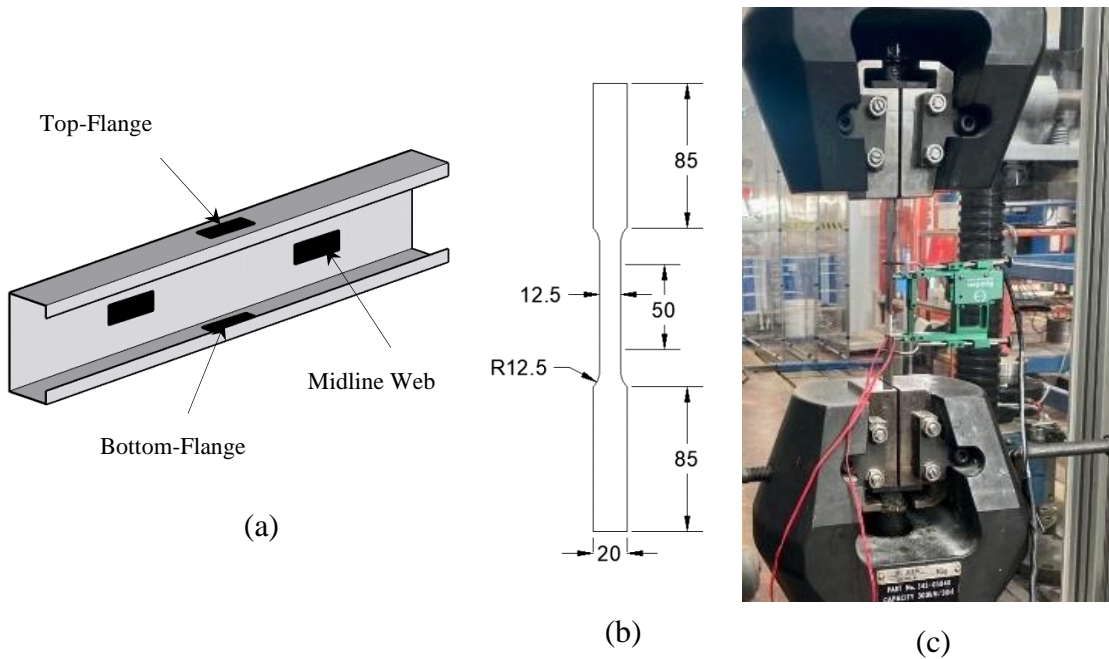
(a) Sampling locations of CFS tensile coupons, (b) dimensions of coupon (in mm) and (c) test set-up
